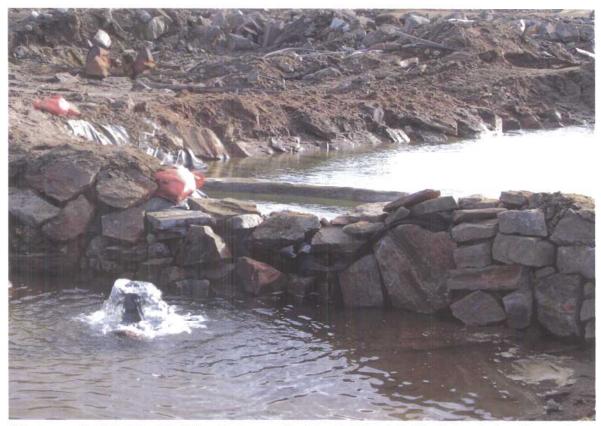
Constructing the Pond: The ABS Pipe Allows Water to be Siphoned Off From the Base of the Pond and Also Controls the Water Level in the Pond
